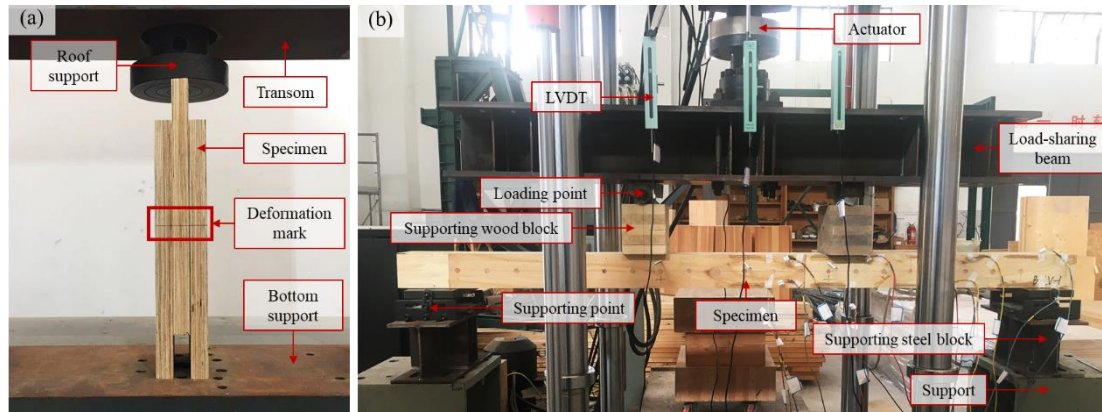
Loading device: (a) Double-shear tests of joints; (b) Bending tests of beams
